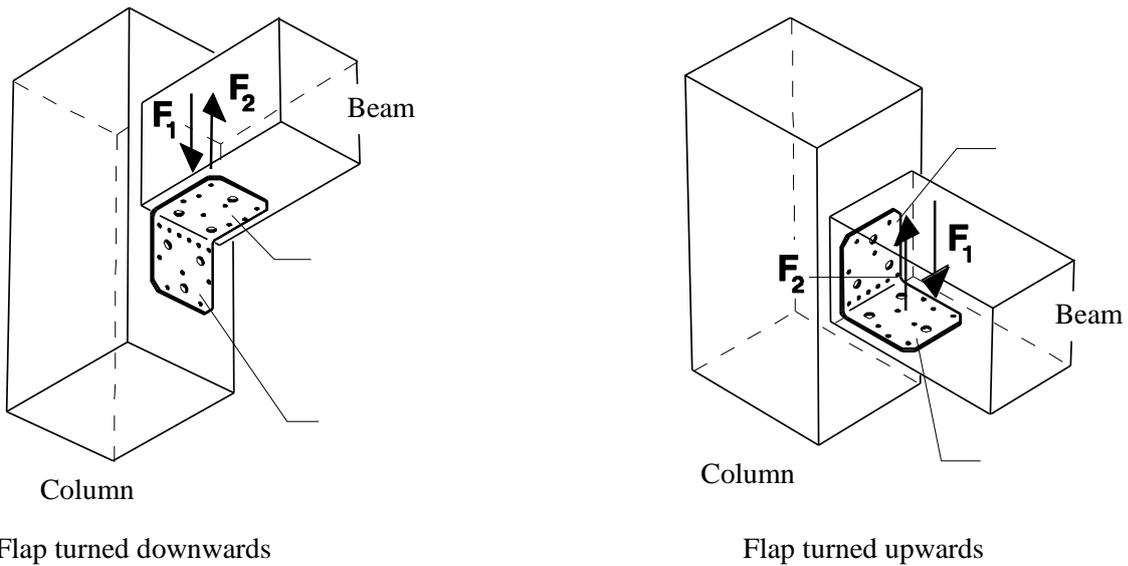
Beam to column connection – Angle bracket without a rib
